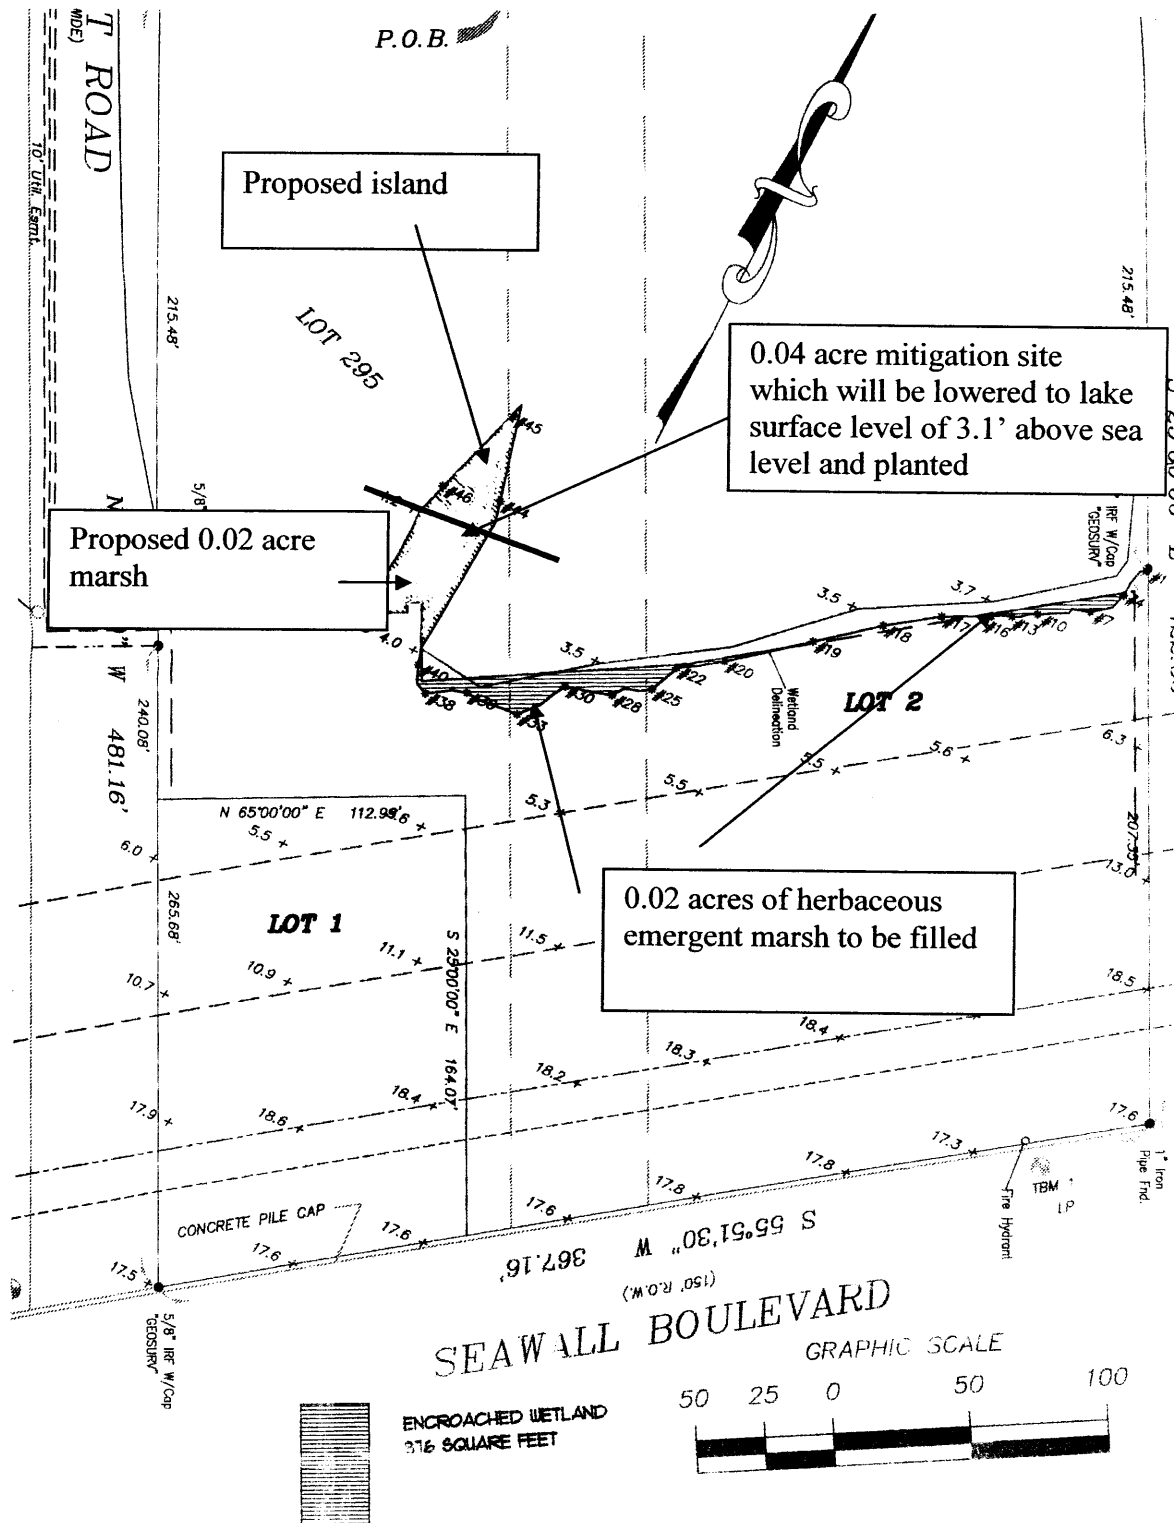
Ocean Grove Condominium Construction site showing finger of land that is to be lowered in elevation to construct 0.02-acres of marsh and 0.02-acres of island habitat.
